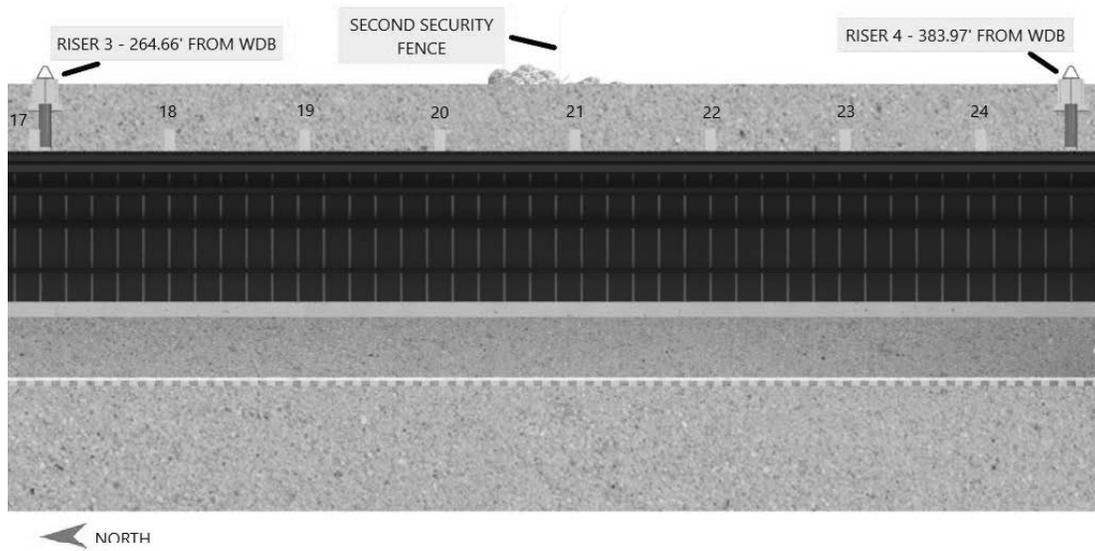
Riser 3 to Riser 4 Tunnel Section.
